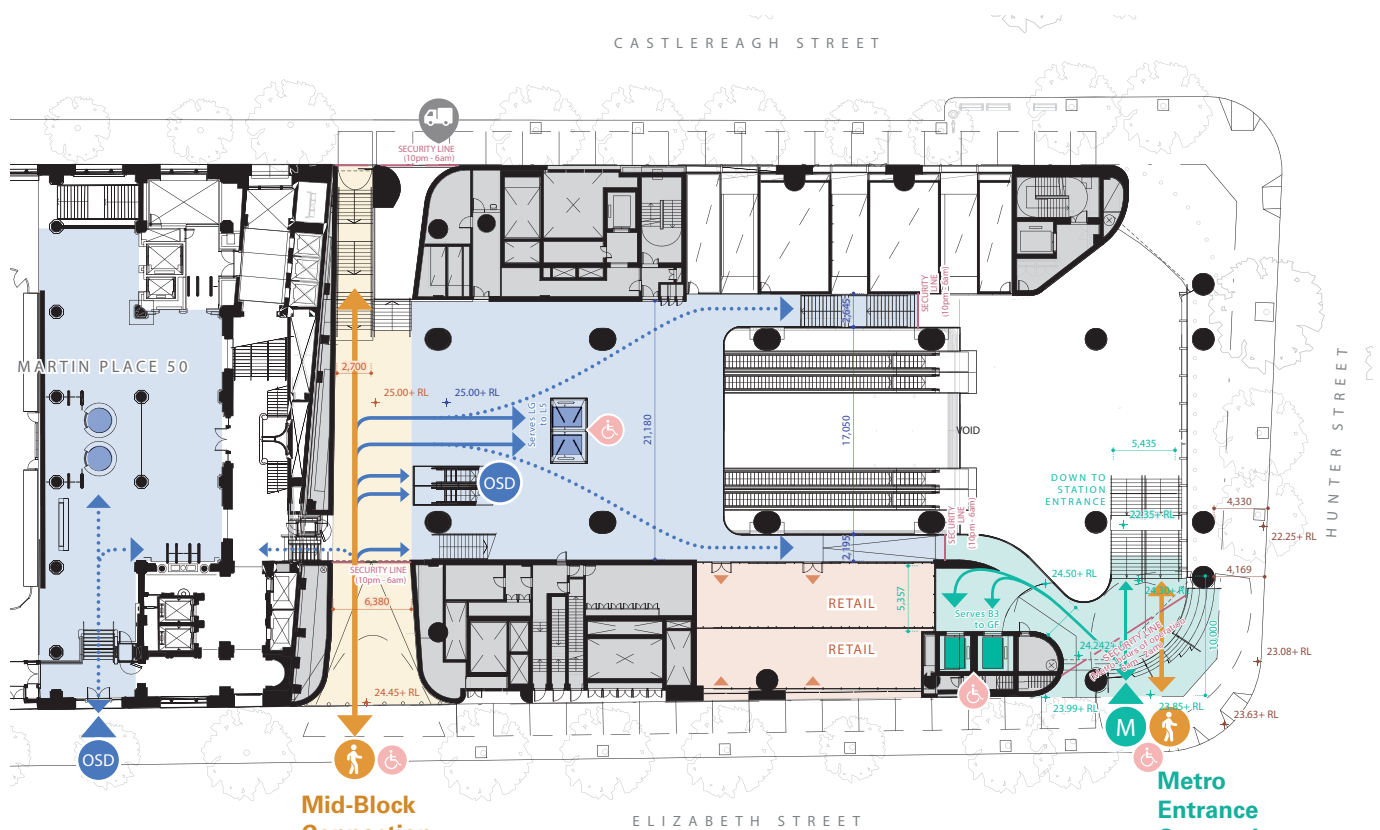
Ground Floor Plan - Elizabeth Street by Grimshaw
